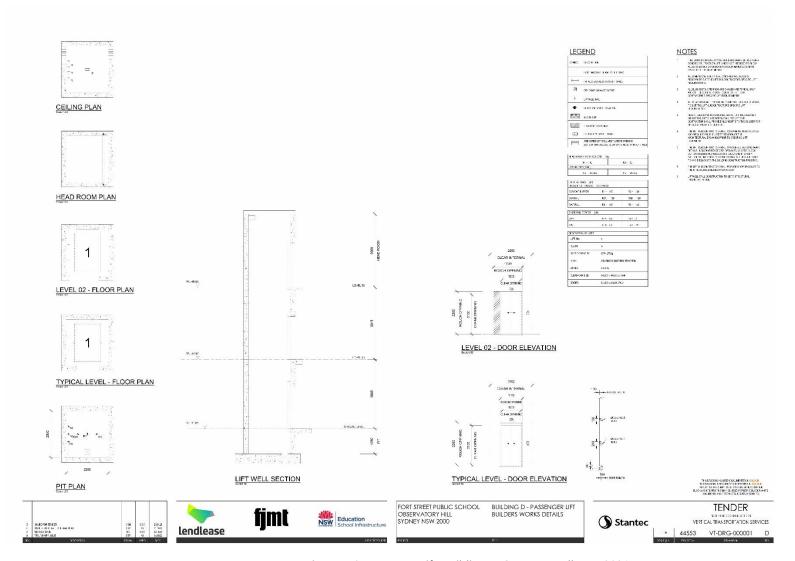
Passenger Lift, Building J. (Source: Lendlease, 2021)
